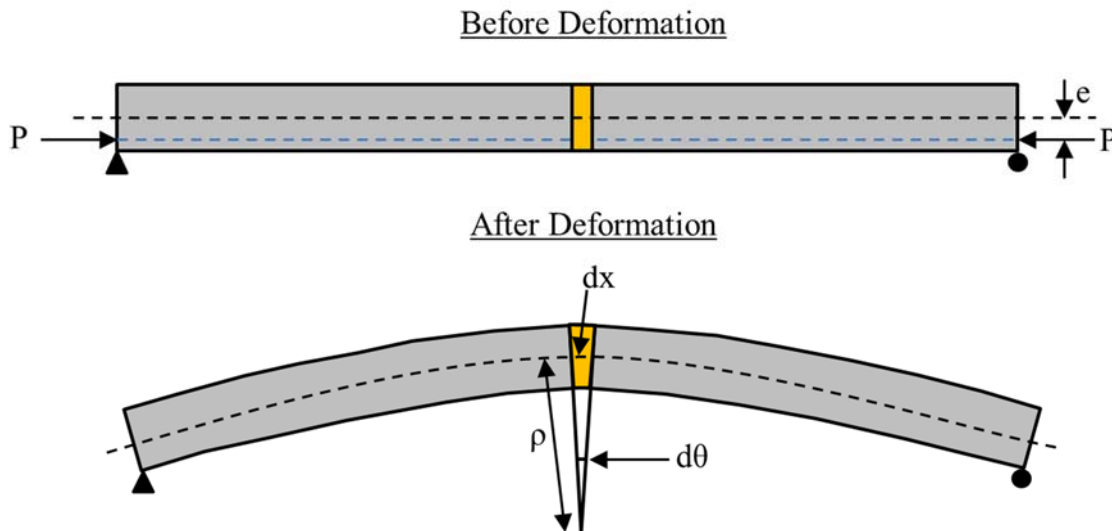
Engineering Beam Theory in a Flat-Strand Prestressed Girder (Adapted from Hibbeler 2006)
